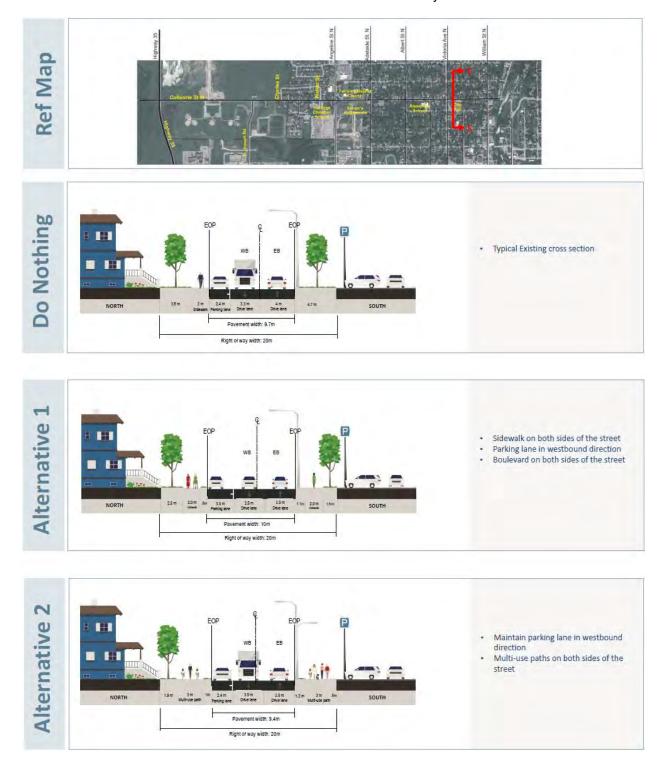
Segment E1: Colborne Street - East of Victoria Street
